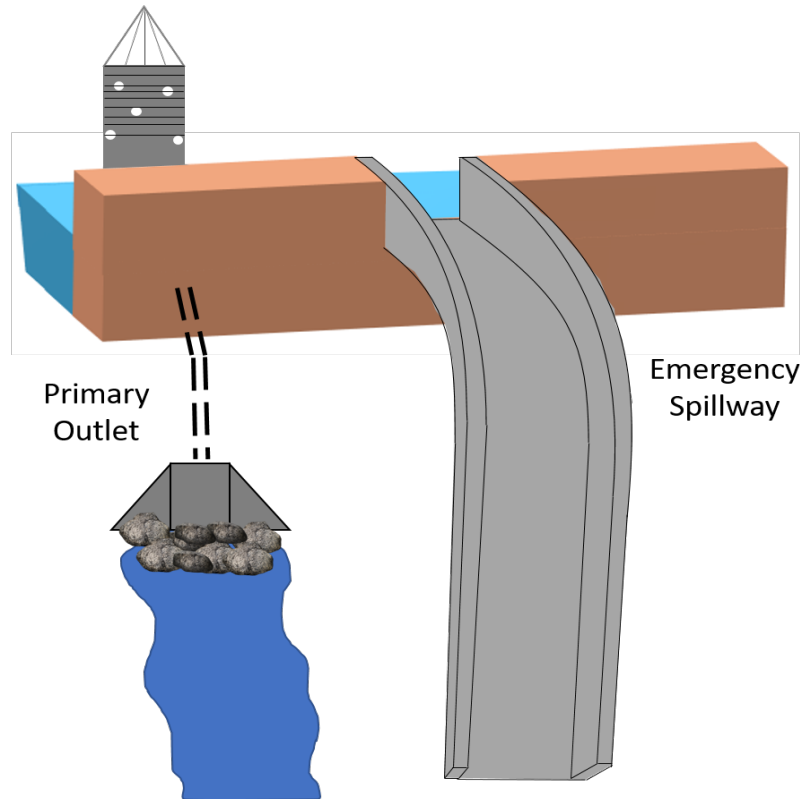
Identification of Basin Primary Outlet and Emergency Spillway
